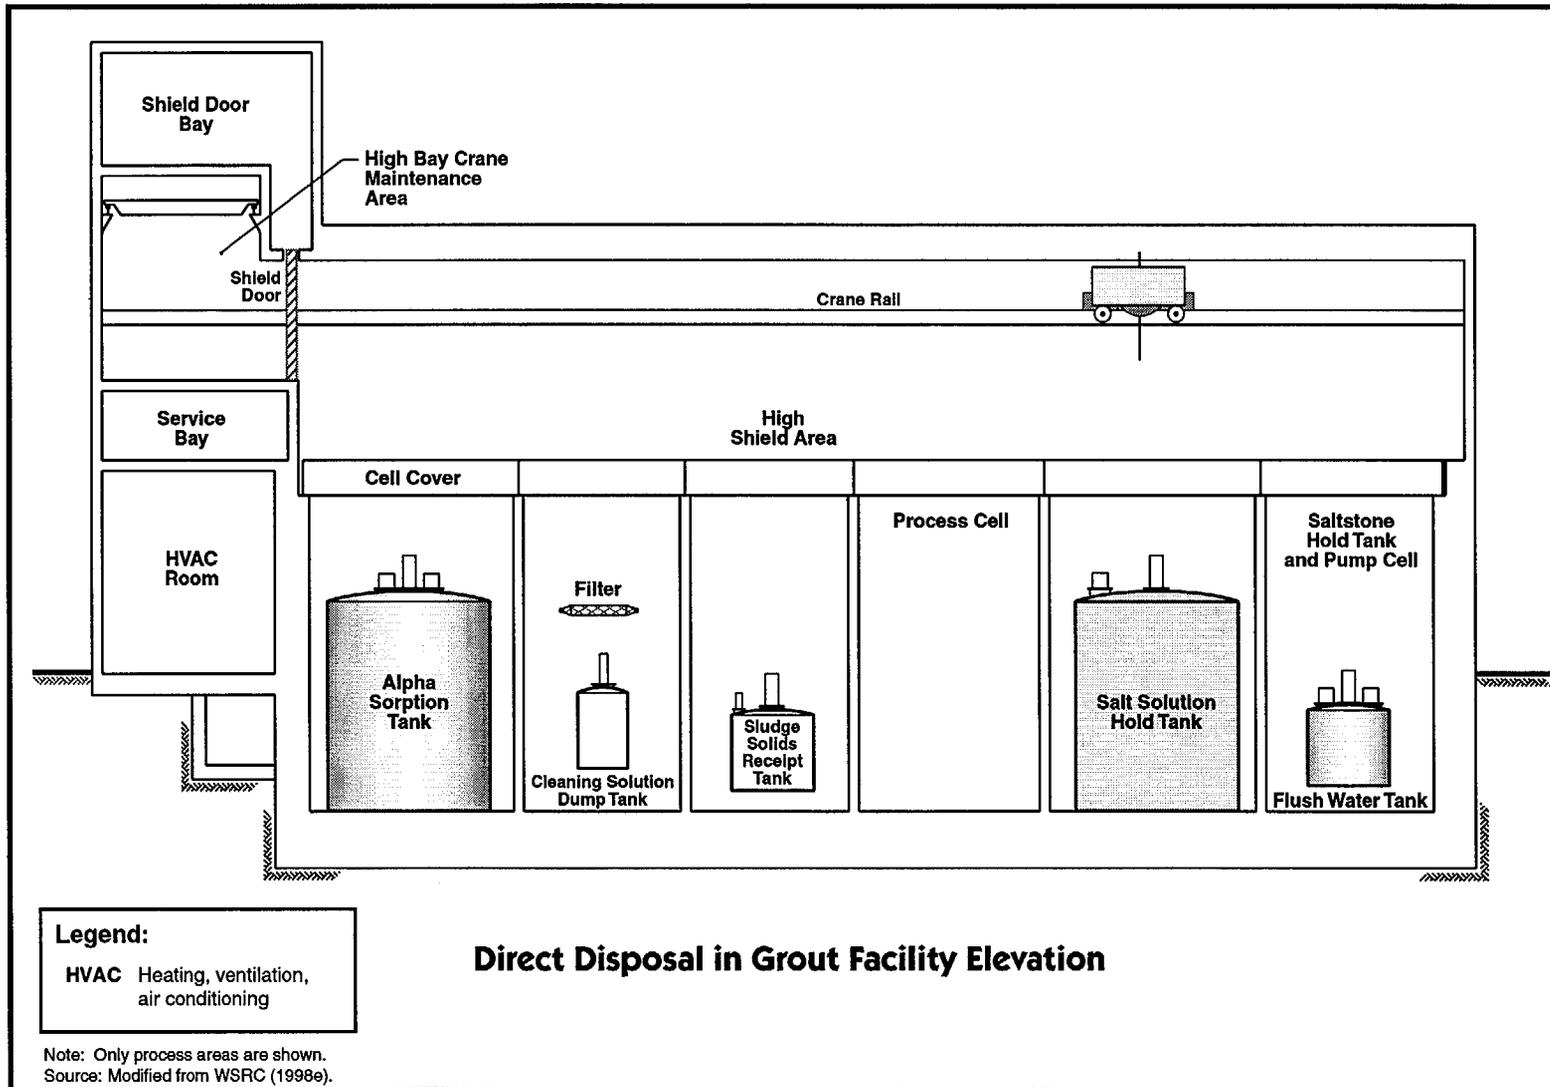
Elevation plan for Direct Disposal in Grout facility.
